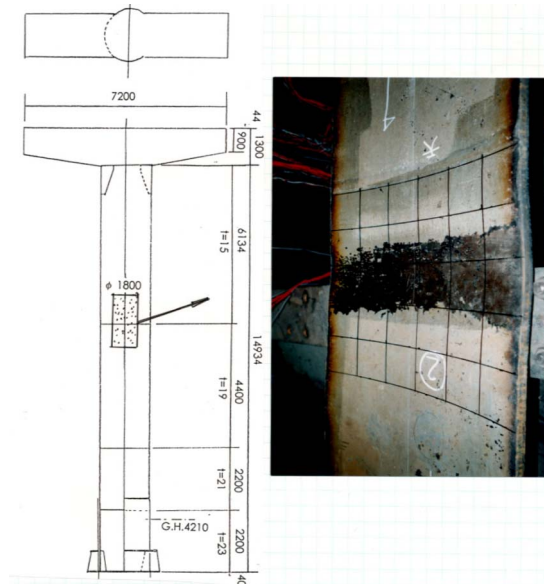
The Steel Plate Cut from the Damaged Pier
